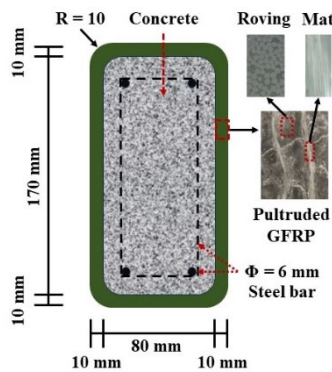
Cross-sectional design of concrete infilled hybrid beam.
